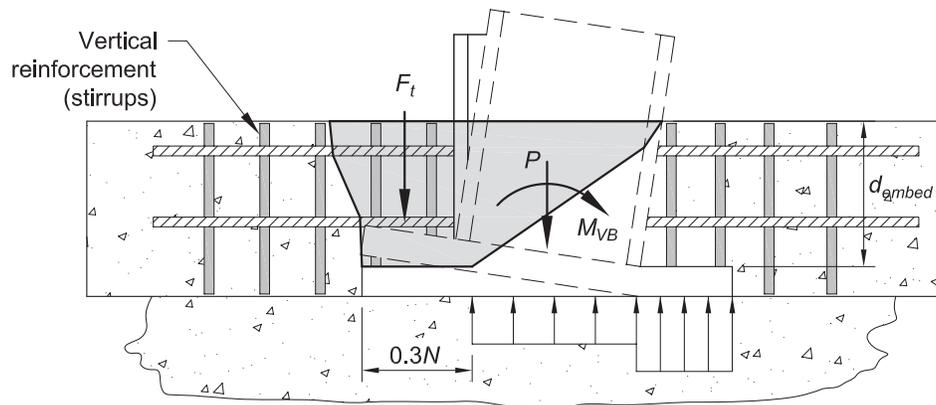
Breakout force of concrete above the tension side of the connection.
